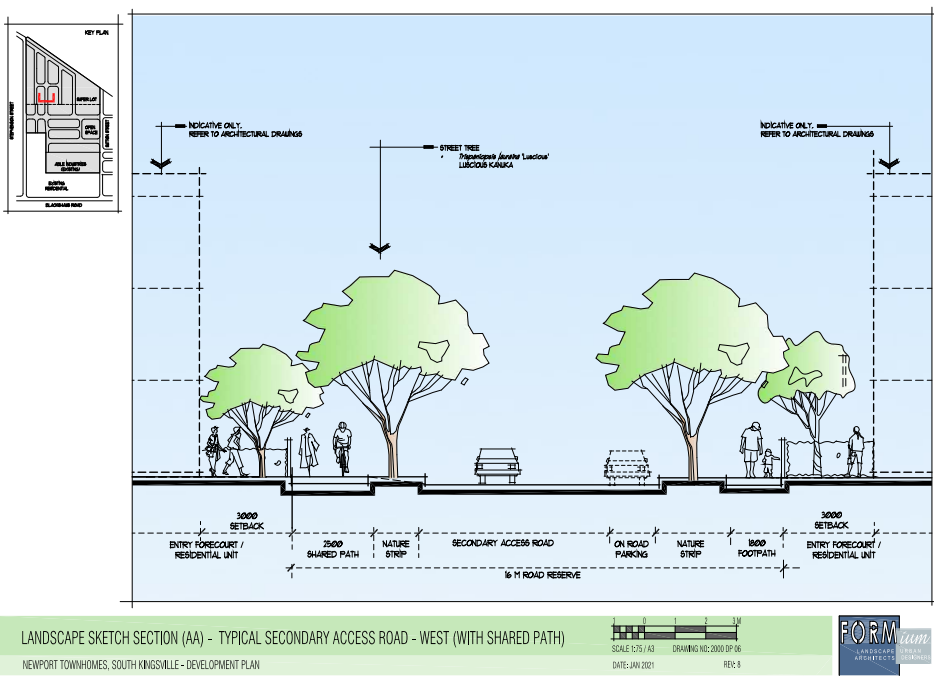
Indicative Typical Secondary Access Road - west (with Shared Path) (Source: Formium)
